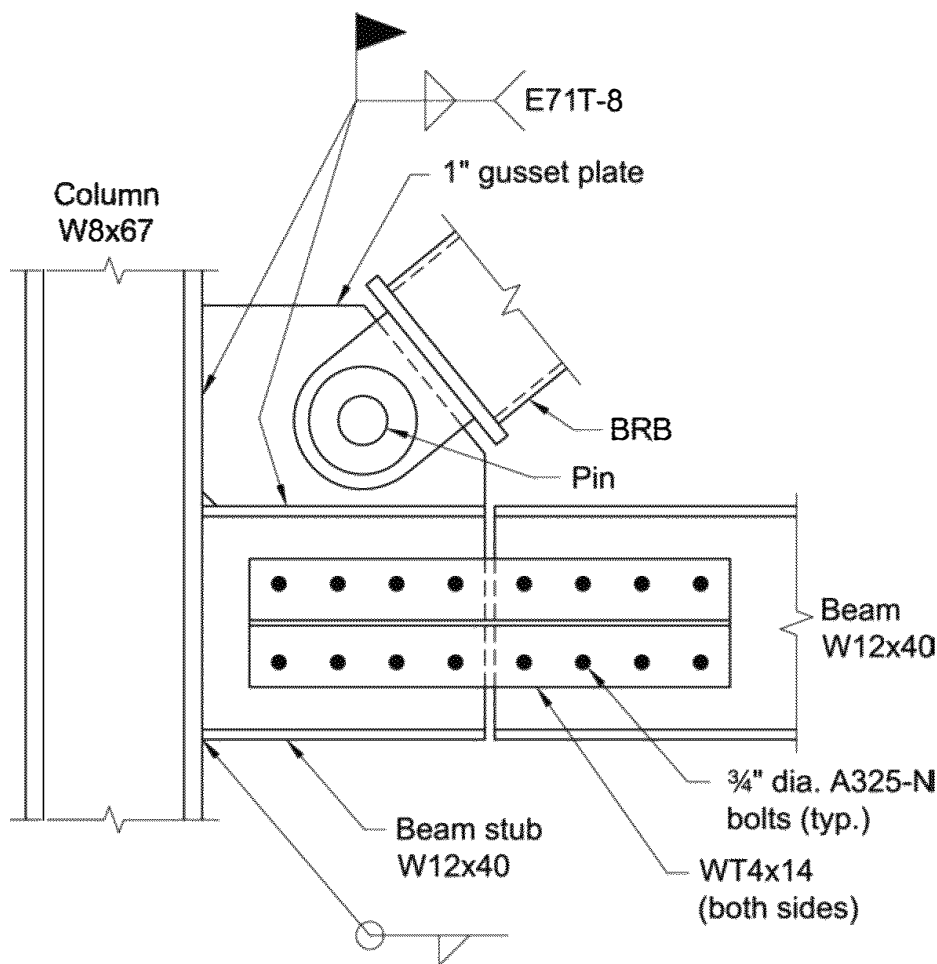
Detail of connection with hinge (Fahnestock et al., 2006).
